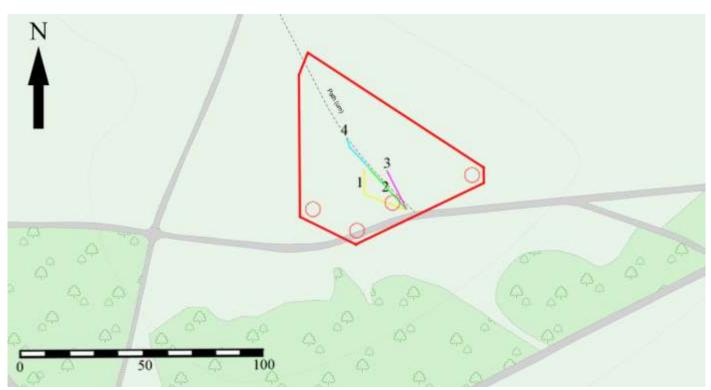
Site plan showing location of the groundworks, trenches are numbered in the order of excavation and the circles indicate benches to be removed
